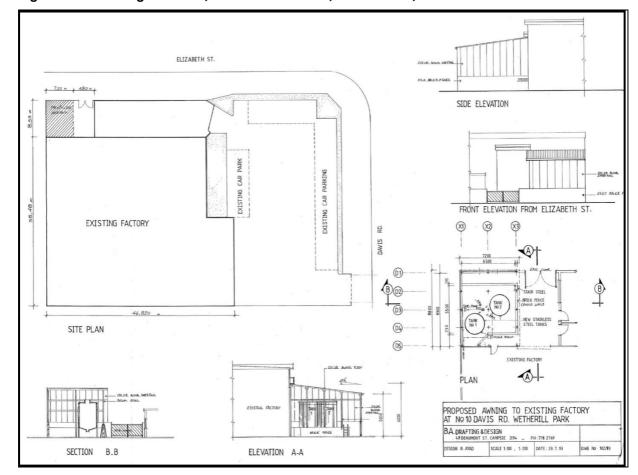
Existing Site Plan, Lot 603/DP 260618, 10 Davis Rd, Wetherill Park
